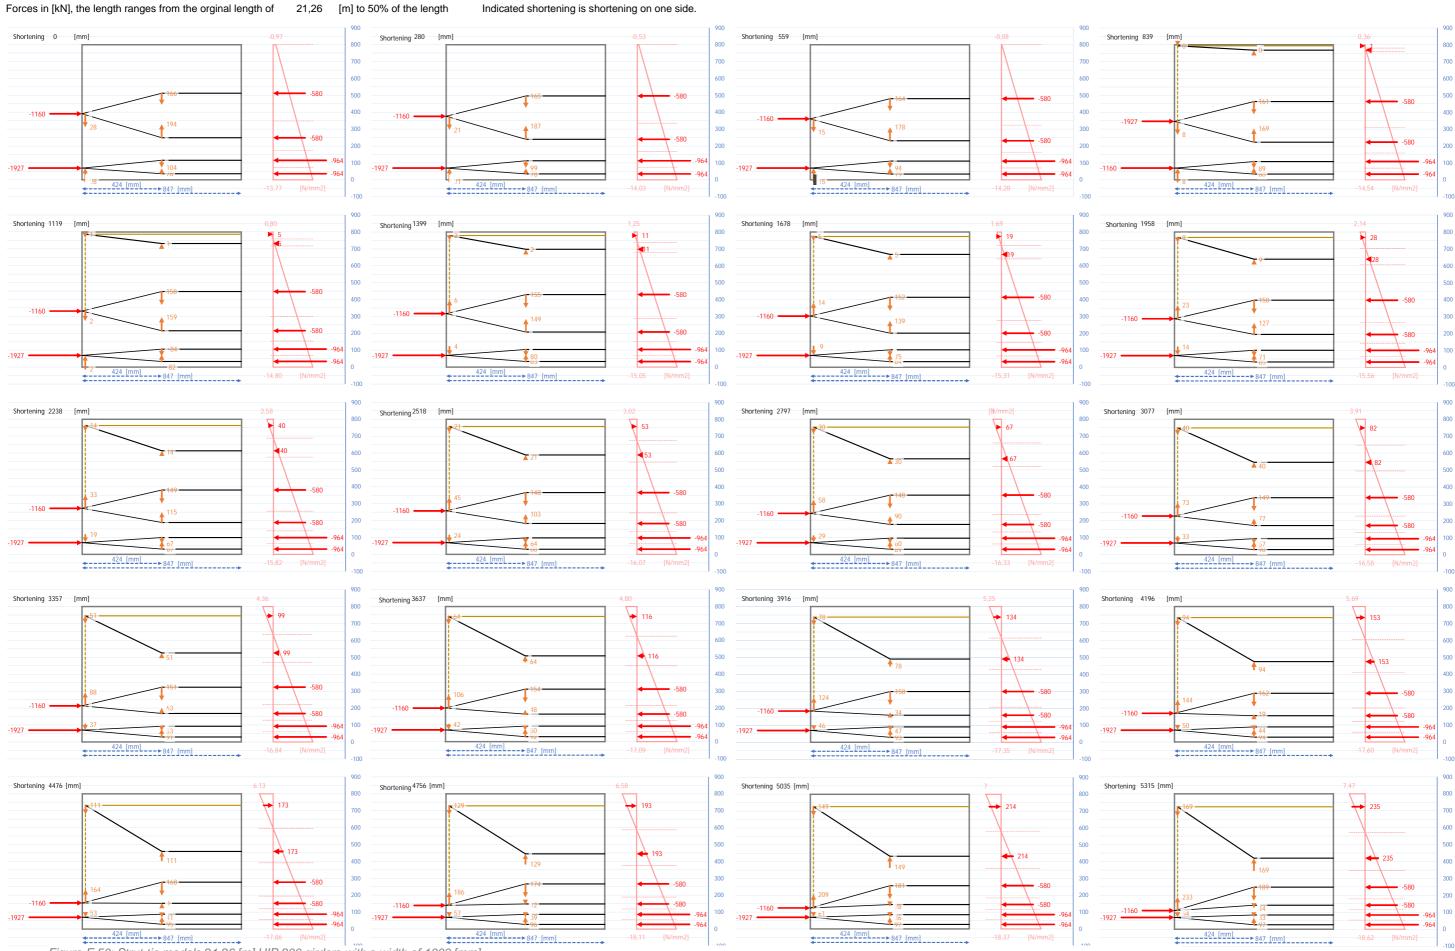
Strut-tie models 21,26 [m] HIP 800 girders with a width of 1000 [mm].
